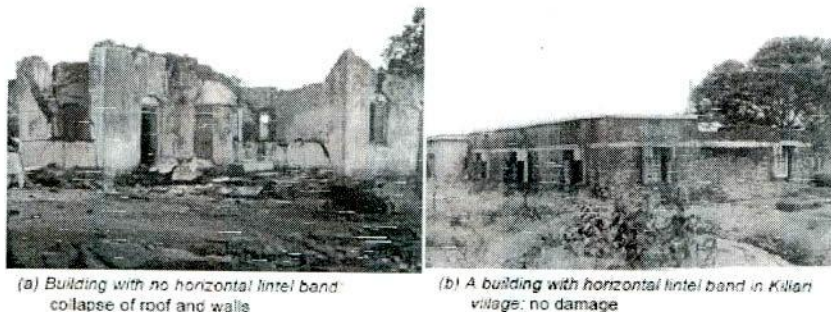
1993 Latur Earthquake one masonry house in Killari village had horizontal lintel band and sustained the shaking without damage
